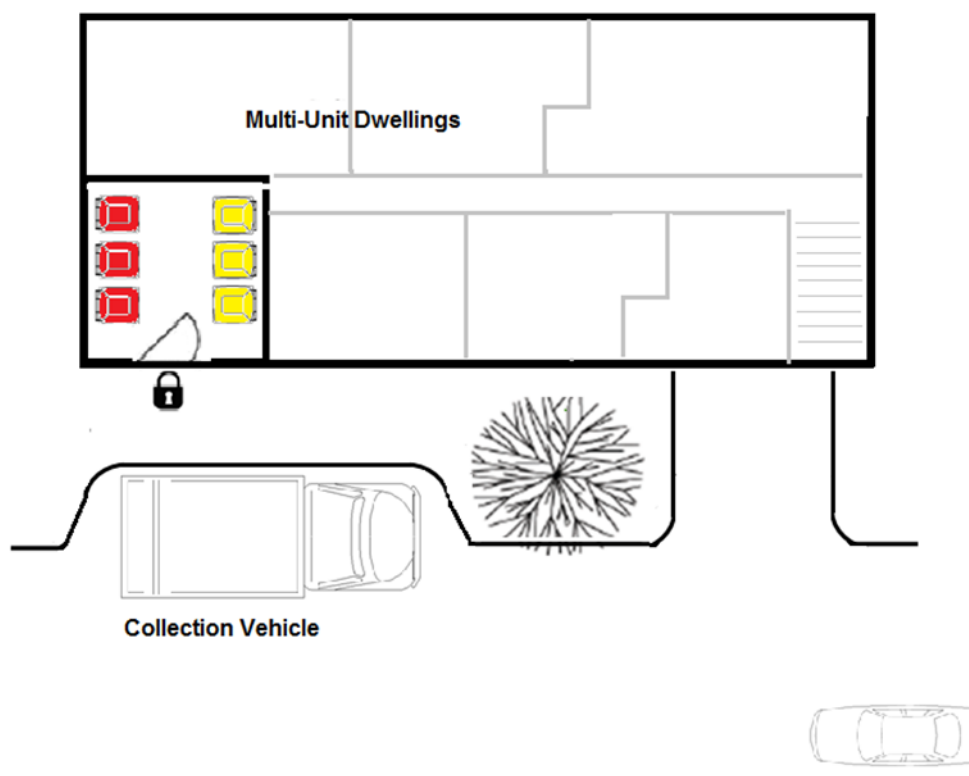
Use of off street ground floor level storage area for collection (with lay-by)
